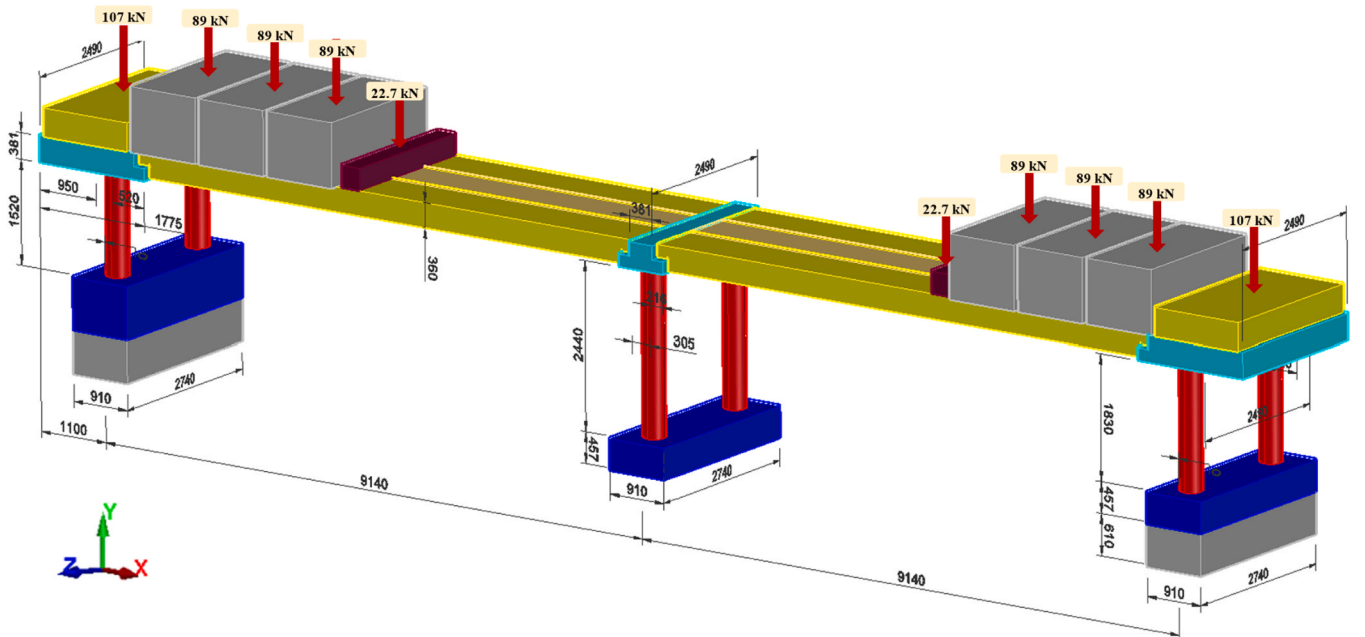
3D view of the bridge model (all dimensions are in mm).
